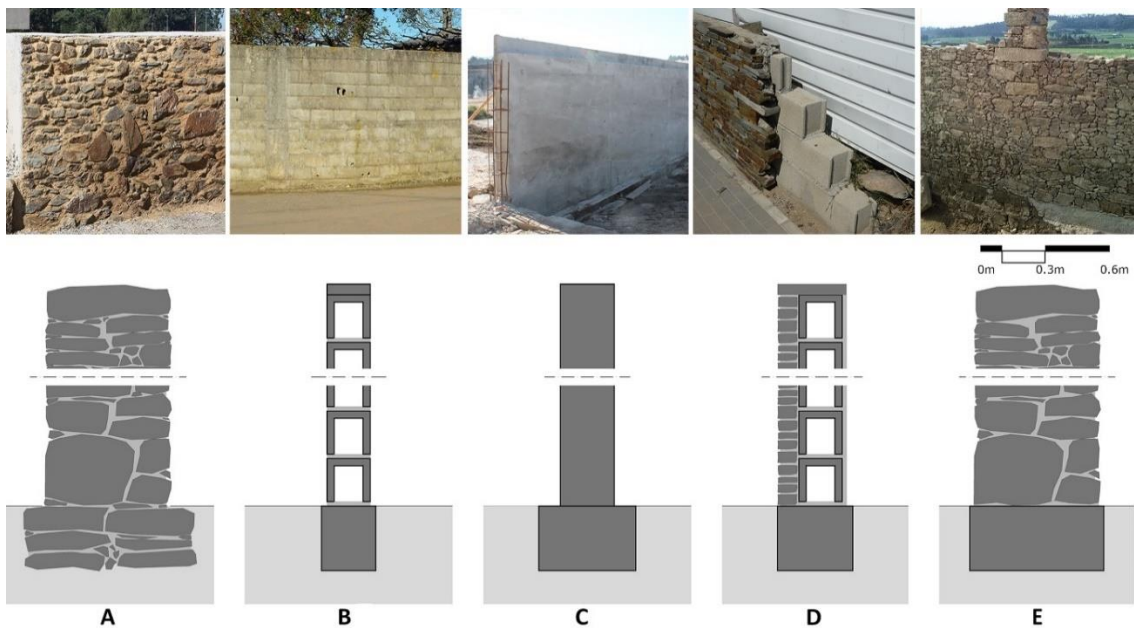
Common farm wall rebuilding solutions used in the survey area (with typical cross-sections).
